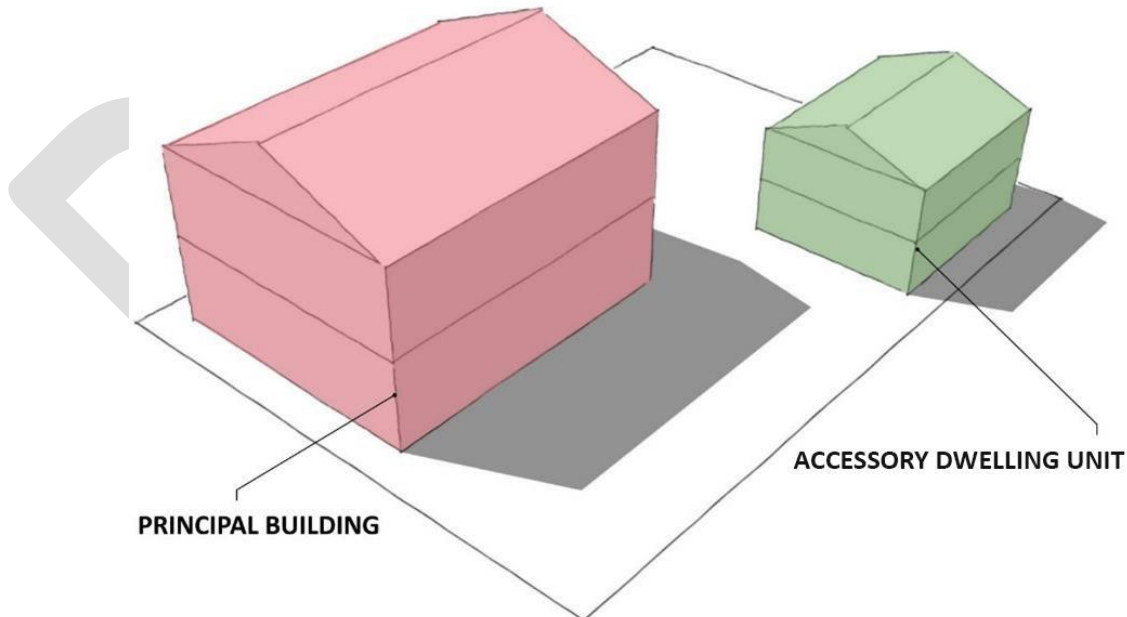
Illustration of an Accessory Dwelling Unit and Principal Building on Same Parcel
